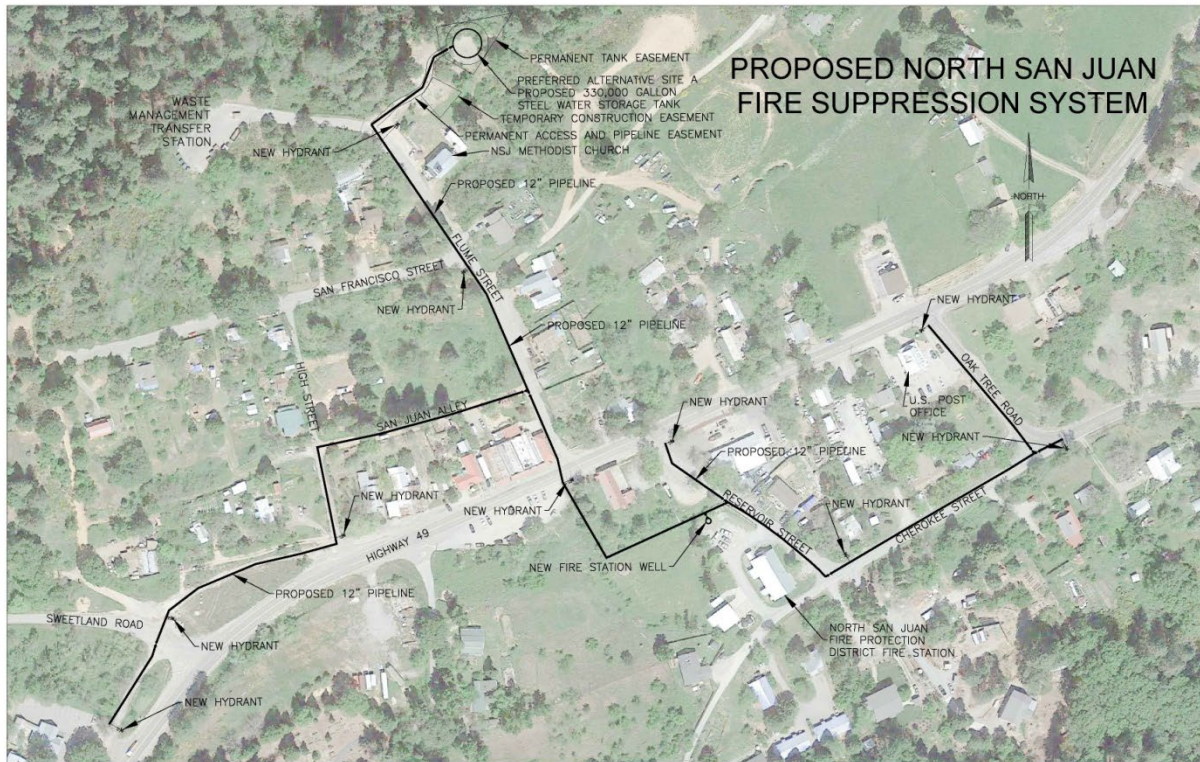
Site Plan for the North San Juan Fire Suppression Project which was revised to show the new well location in a previously-disturbed area in the fire station parking lot.
